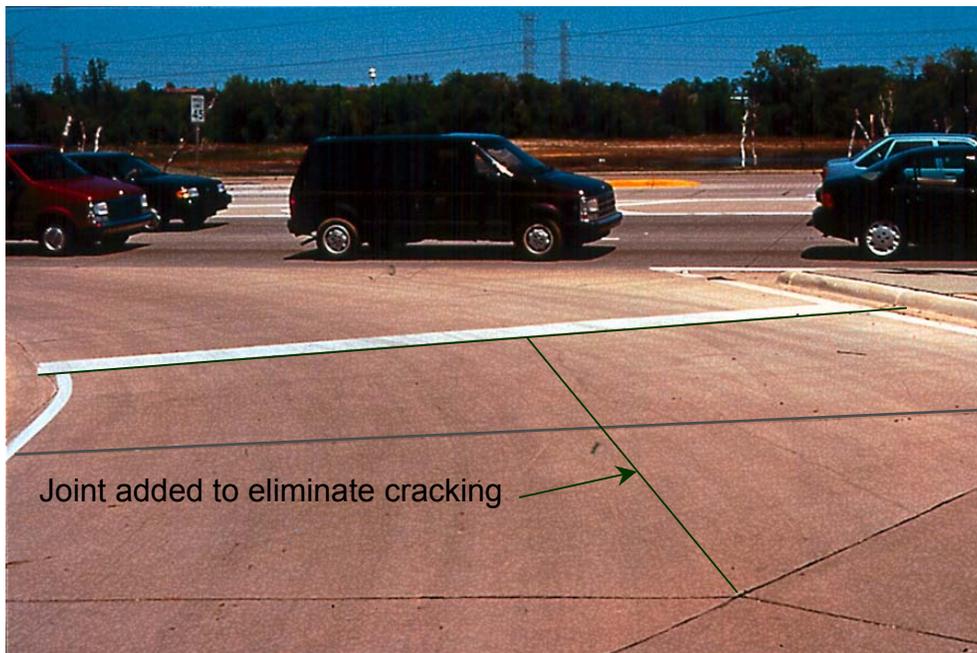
Jointing to eliminate cracking from irregularly shaped areas (Photo courtesy of American Concrete Paving Association).
